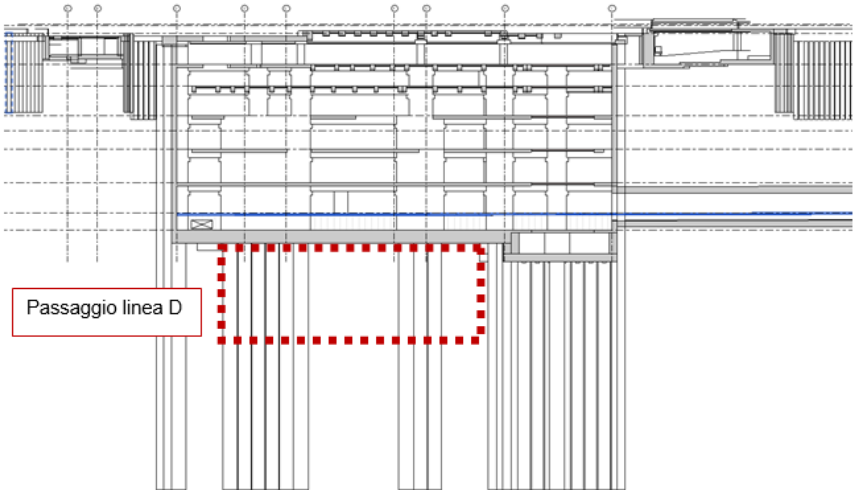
Transverse cross-section – Venezia Station, Rome (Italy)
